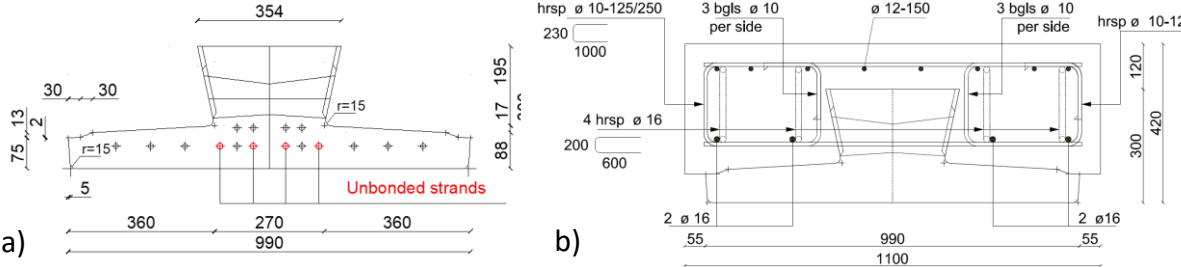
Cross-section of a) prestressed AAC girder with the layout of prestressing strands (16 strands $\phi 12.9$, 4 of them being debonded over a length of 1m) and b) composite girder with the layout of reinforcement in topping concrete.
